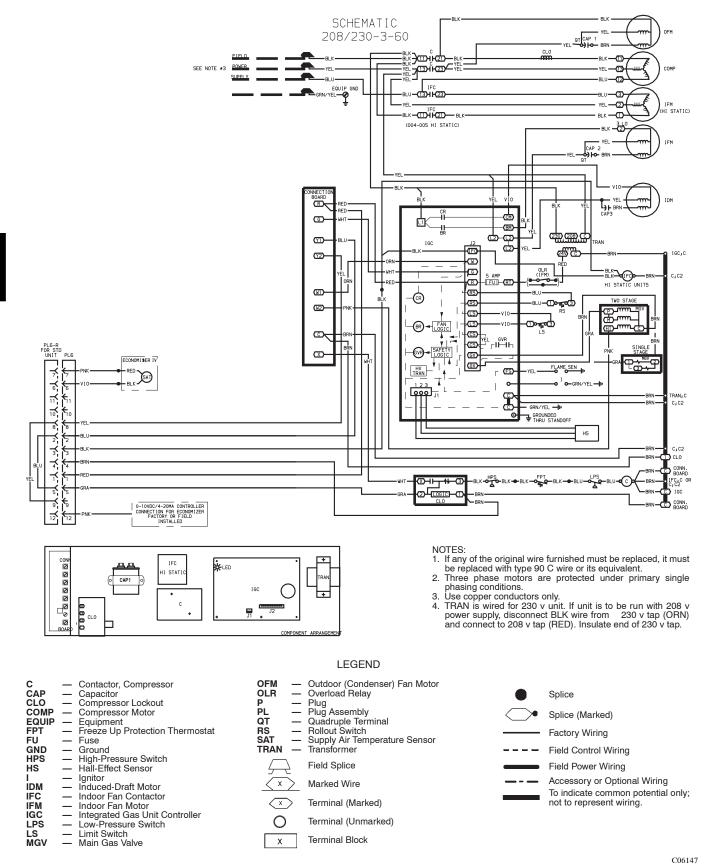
Typical Wiring Schematic and Component Arrangement (208/230-3-60 Shown)
